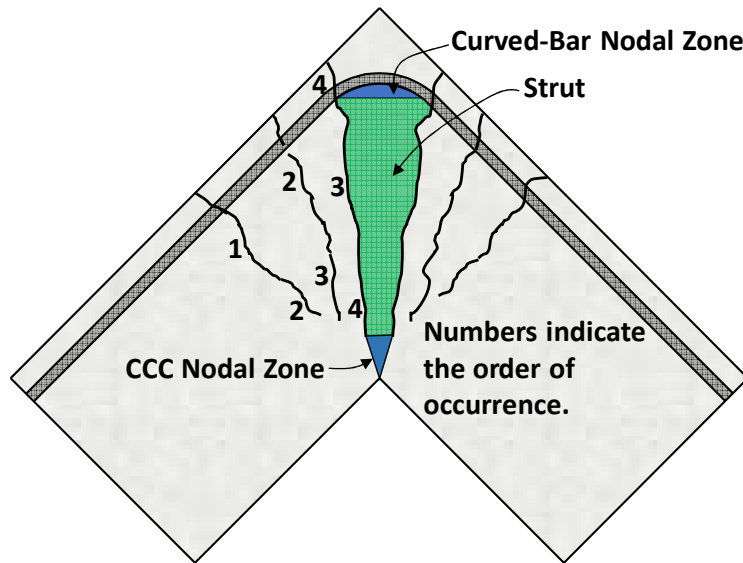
Typical crack formation and propagation in joints of C-Series specimens
